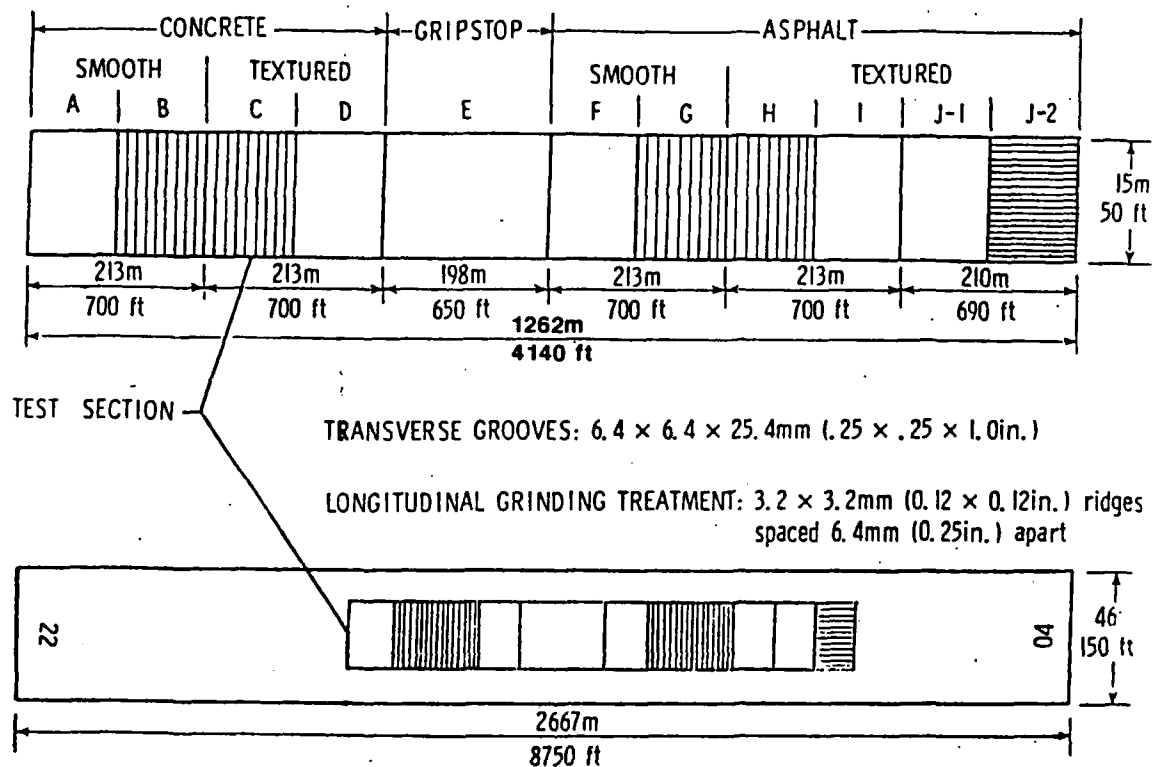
SCHEMATIC OF RUNWAY 4-22 TEST SURFACES AT NASA WALLOPS FLIGHT FACILITY
